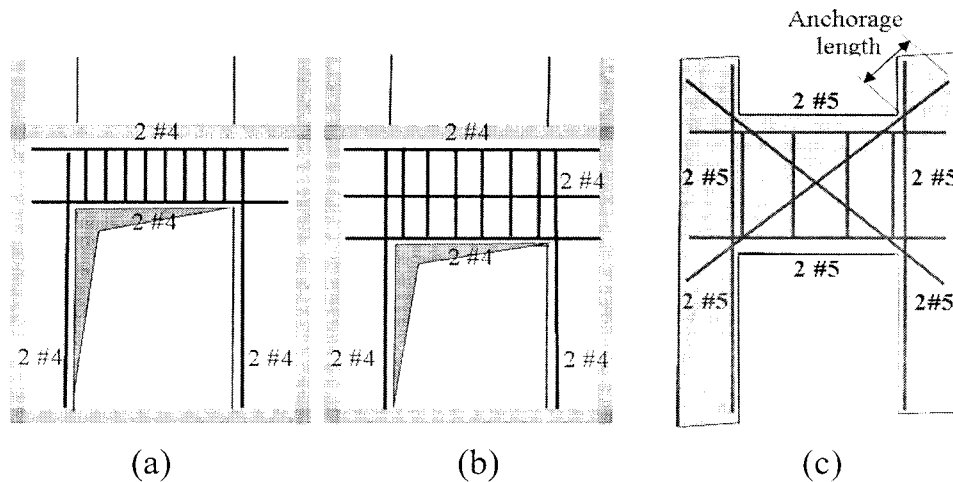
Reinforcement detailing around openings of pierced shear walls
